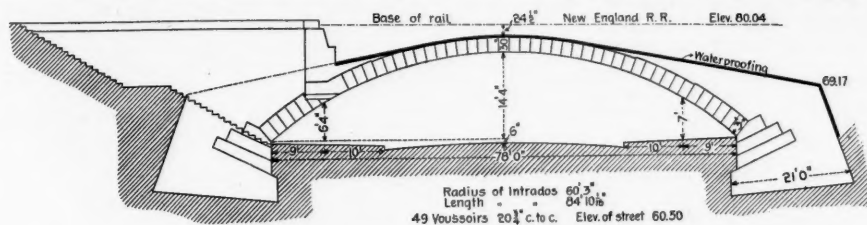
Section Through Center of Hyde Park Avenue Arch, Readville, Mass., New York, New Haven & Hartford Railroad.
